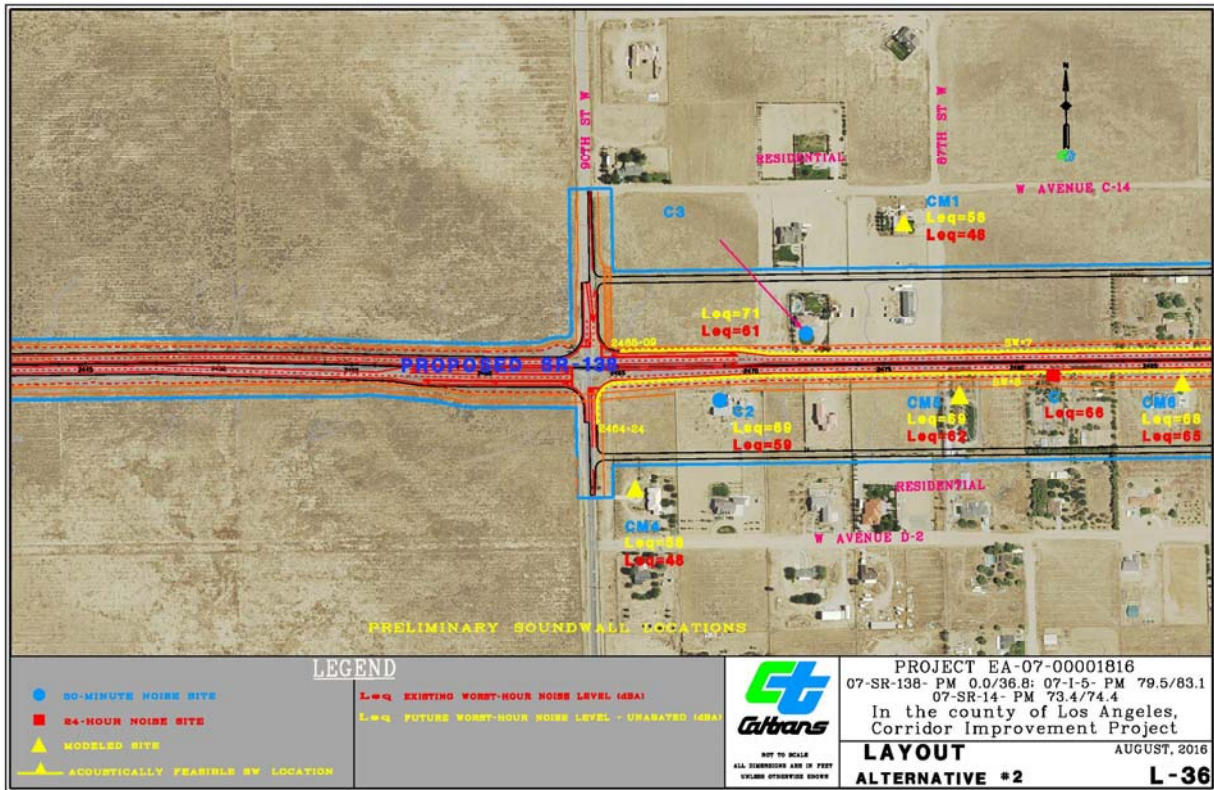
Alternative 2 Soundwall Location – 7 and 8 (sheet 2 of 2)
